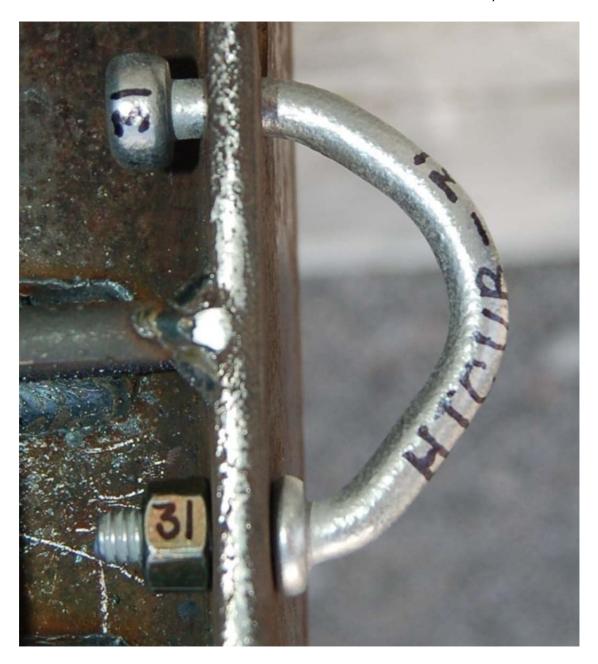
Updated Cable Attachment: Angled Keyway Bolt
